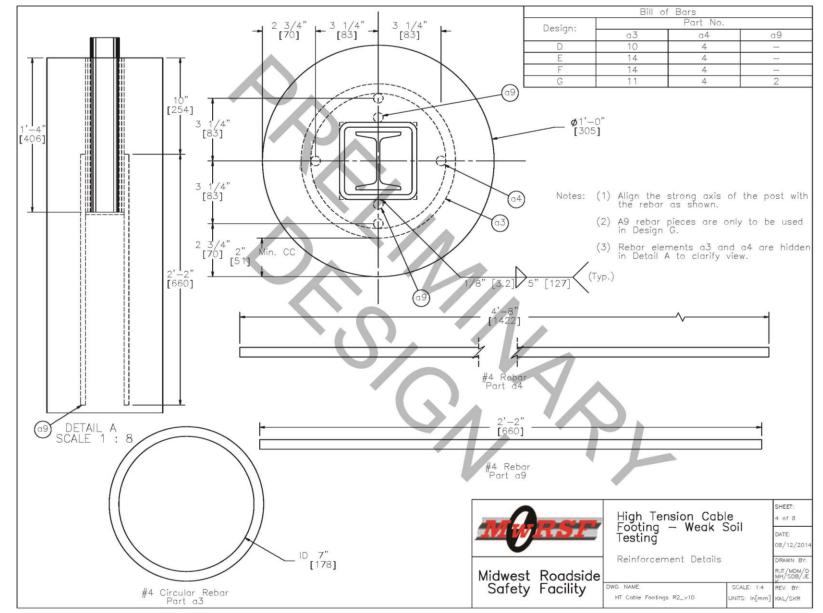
Reinforcement Details, Test Nos. HTCB-5 through HTCB-9
